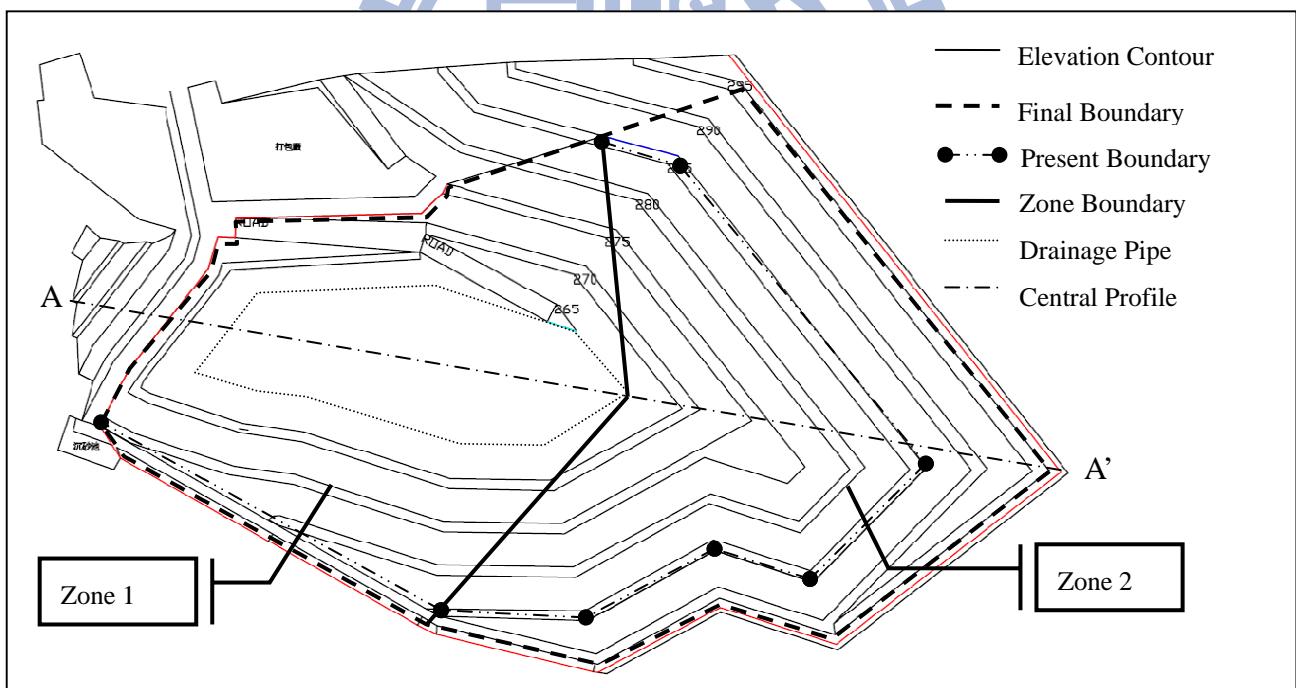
Toufen Landfill from Plan View, Redraw from the Origin Drawing
